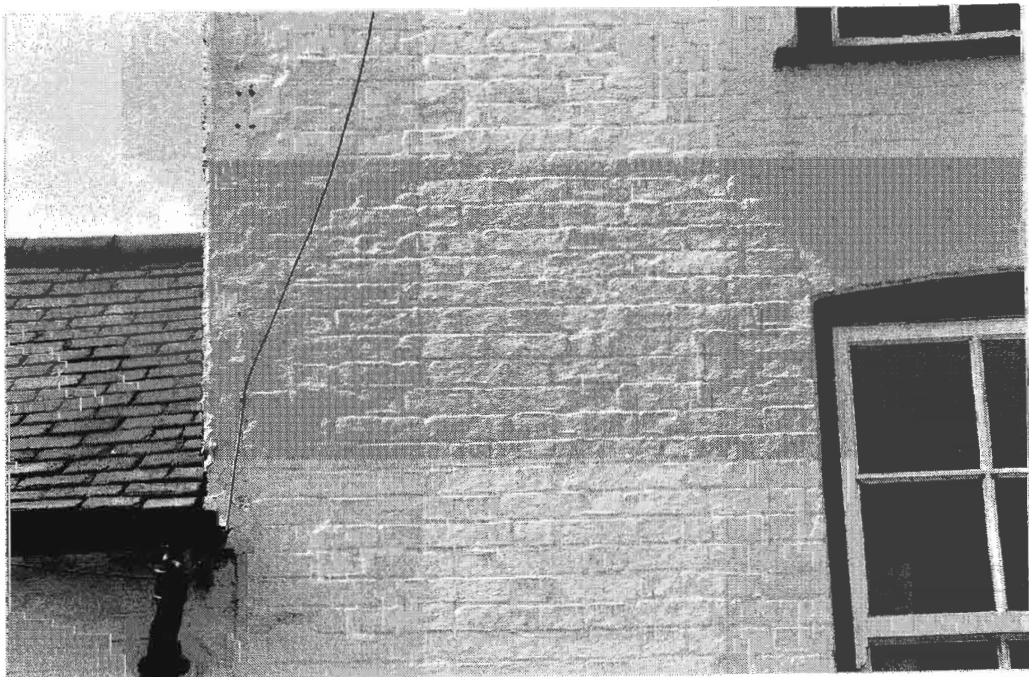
(below) detail of first floor elevation of 18<sup>th</sup> century build, also showing a much altered chimney stack in this part of the building.
